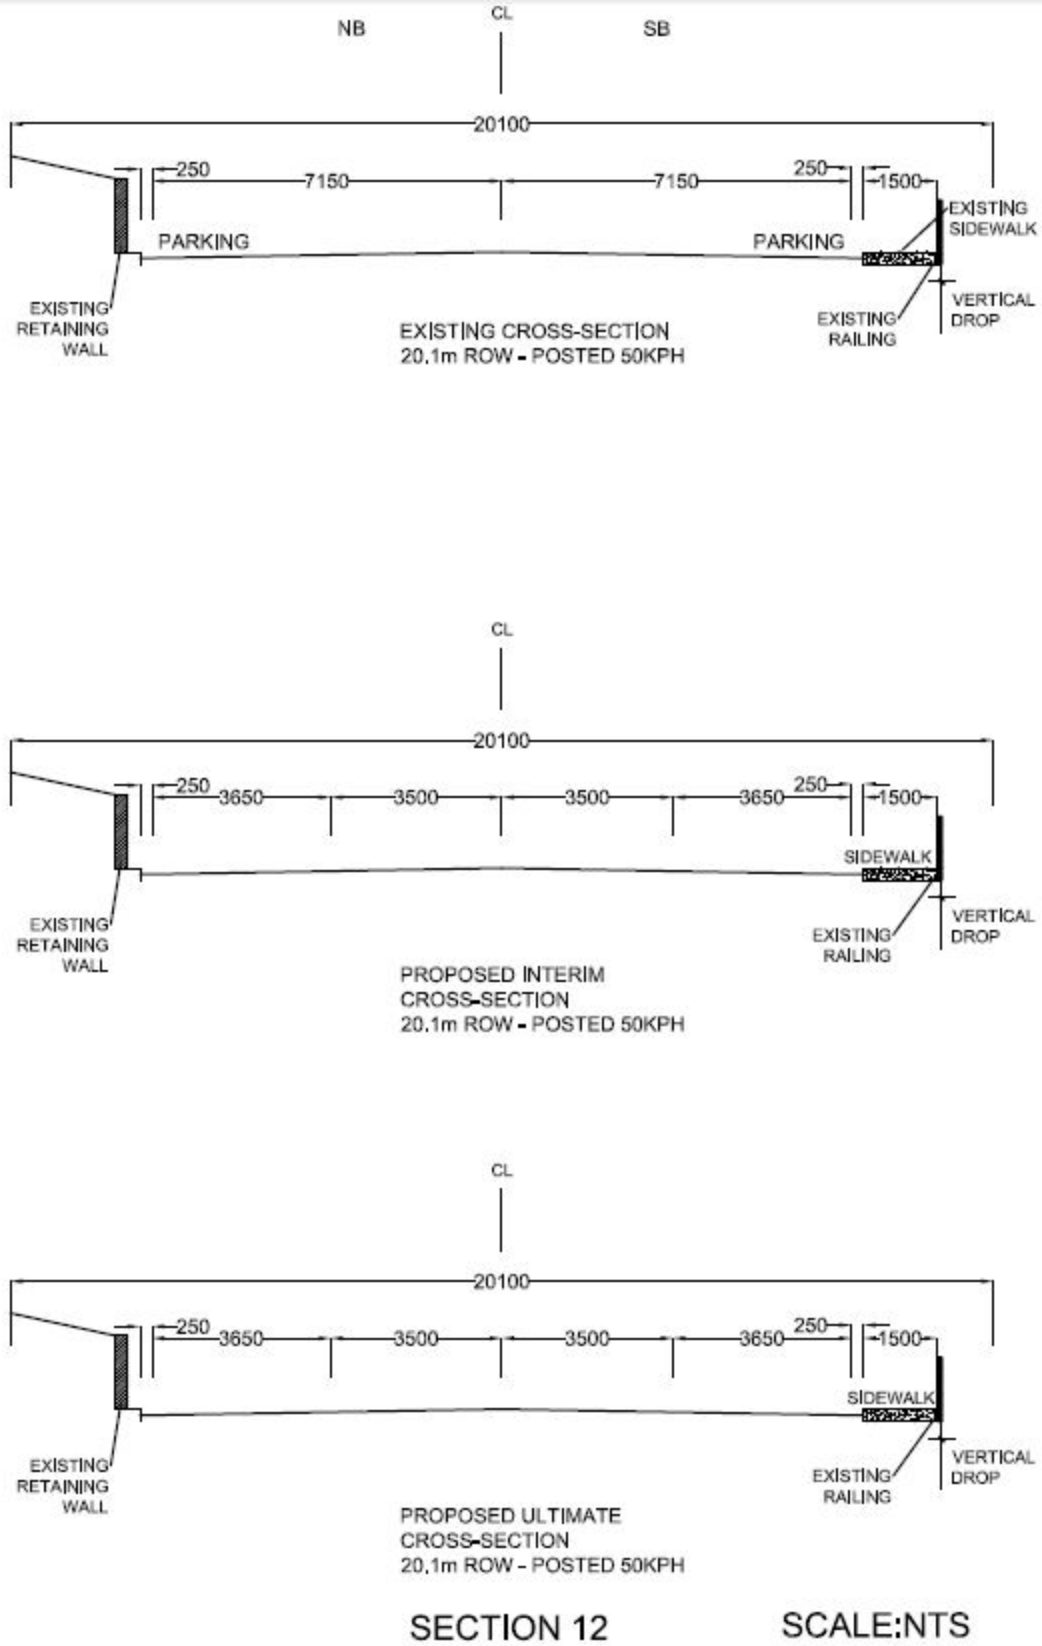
Proposed Section 12 – Hwy 22 South of 4th Ave
